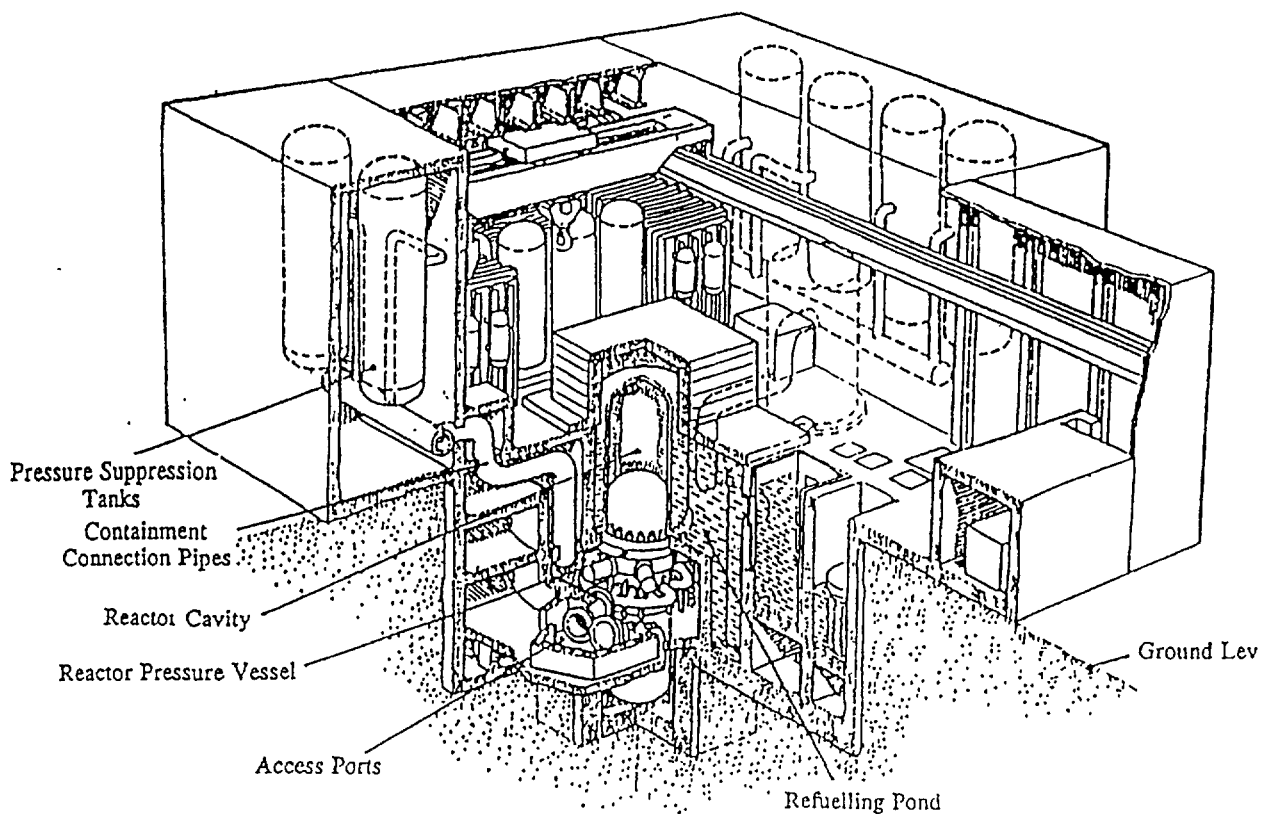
3-D Cut Away of SIRTM Plant Layout
